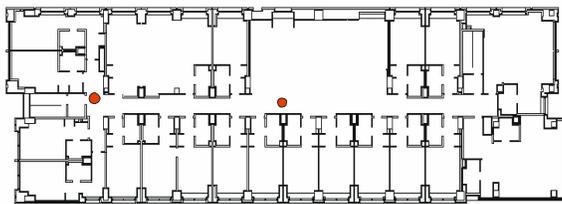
2 nodes in hallway of 1st floor - Configuration 2
